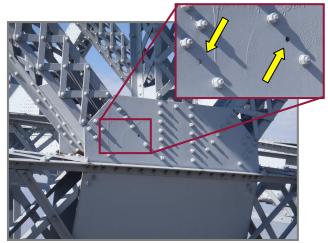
East face of the lower mid-panel gusset at panel point 15 (ML15) showing two blank bolt holes (retrofit) for the ML15-U15 South diagonal connection.
